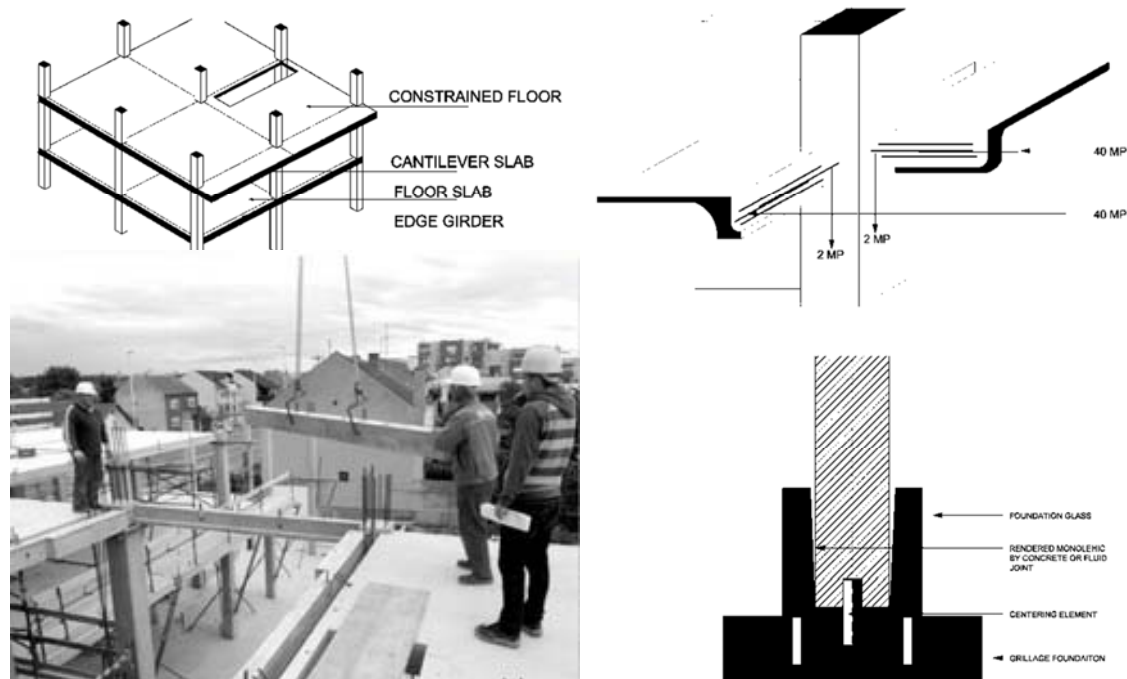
IMS system: (a) Skeleton frame consists in concrete column, pre-stressed beams, cantilever slab, edge rib; (b) Slab to column joint; (c) Top view of standard floor slab; (d) Column joining with foundation (Rahman, SMM 2018). Adopted from [3]
